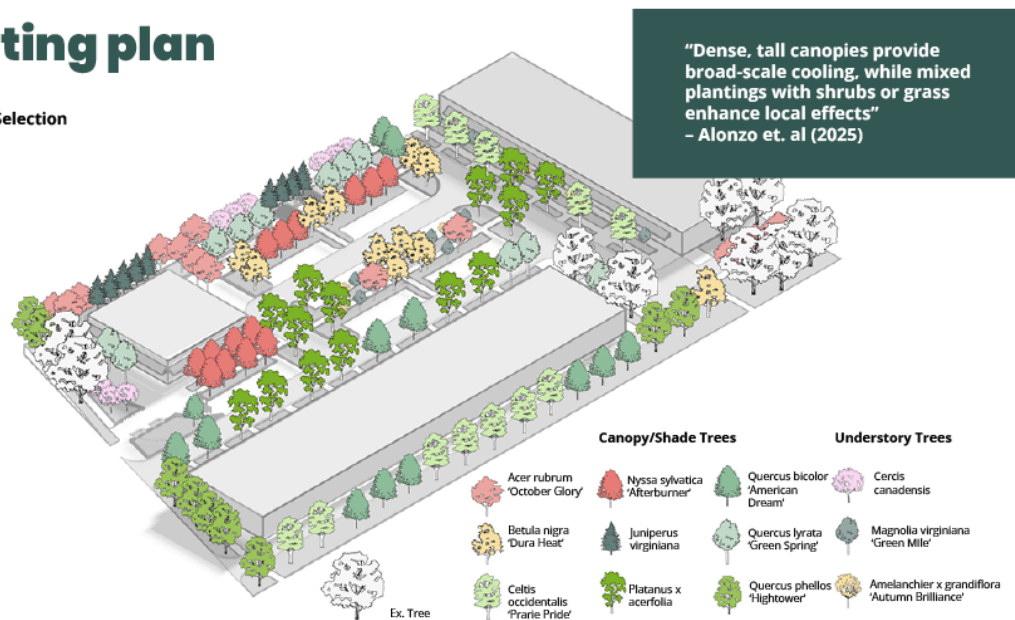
Isometric tree planting plan. Source: Garlow, 2026
